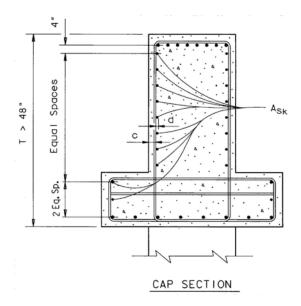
Typical Bent Cap Reinforcement—Inverted-tee Cross Section [6.1]
